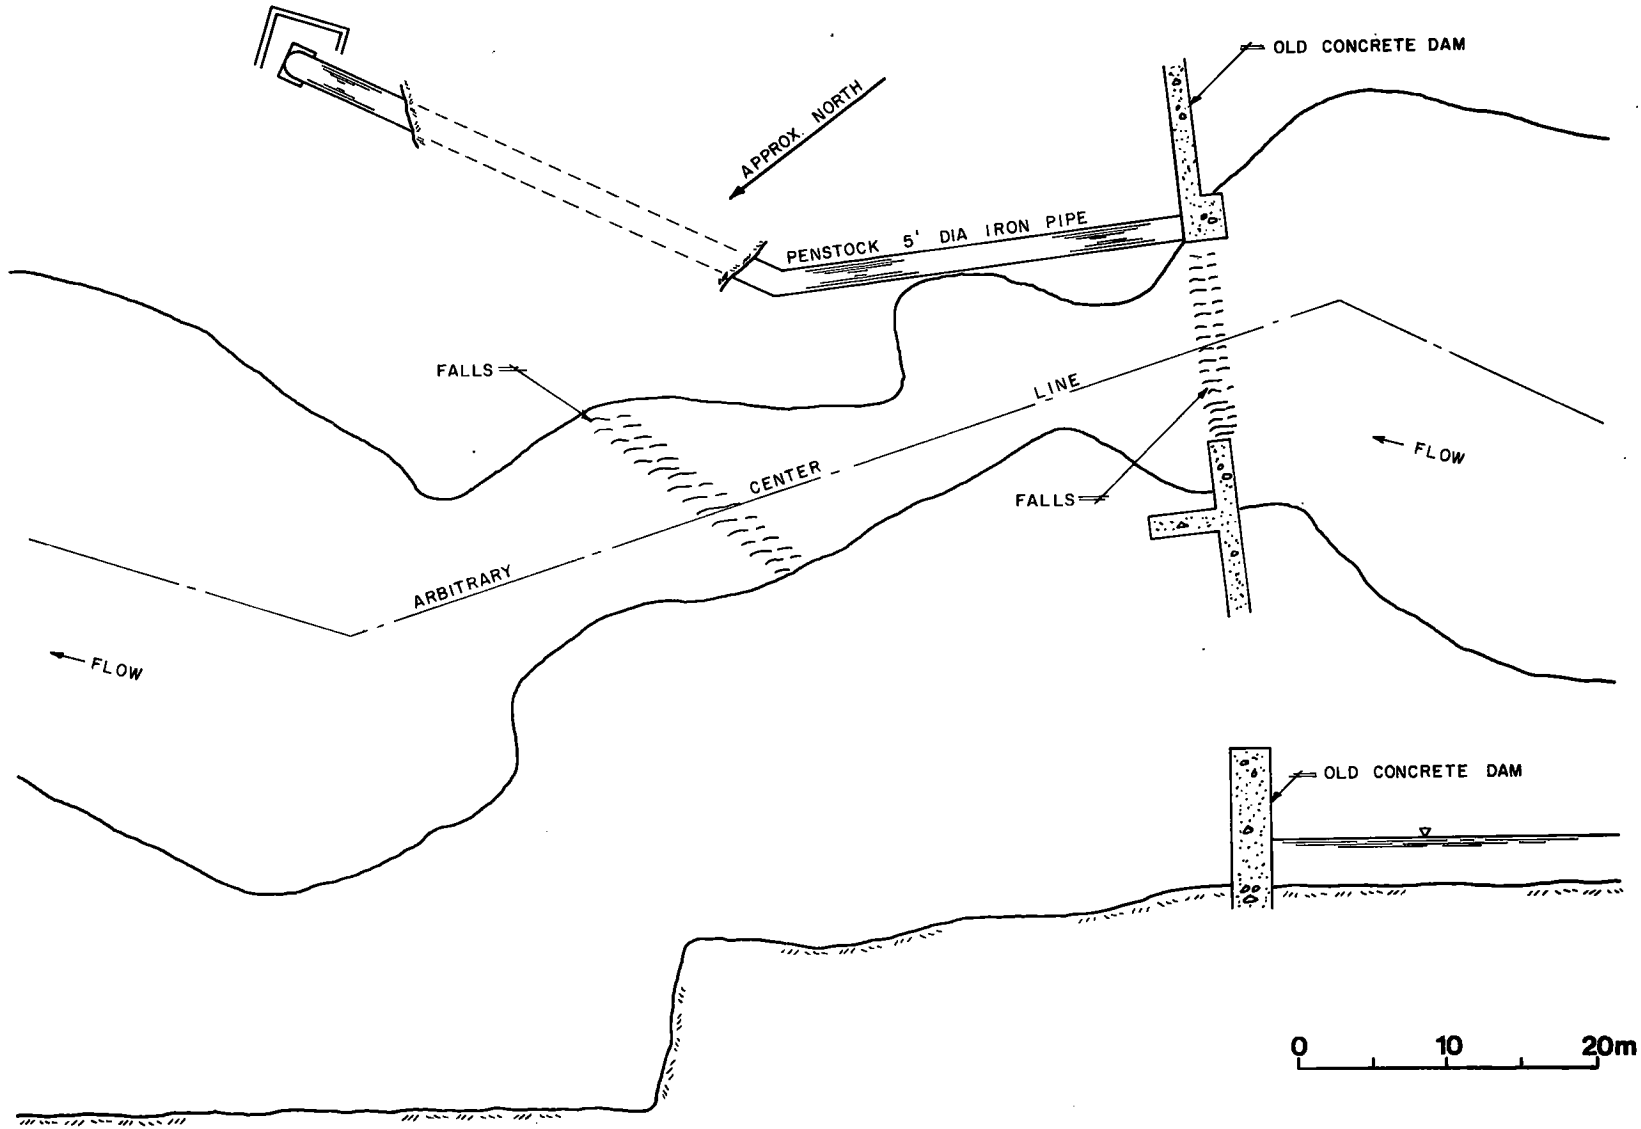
Site plan and profile of Tetagouche Falls, showing the remnants of the power development.
